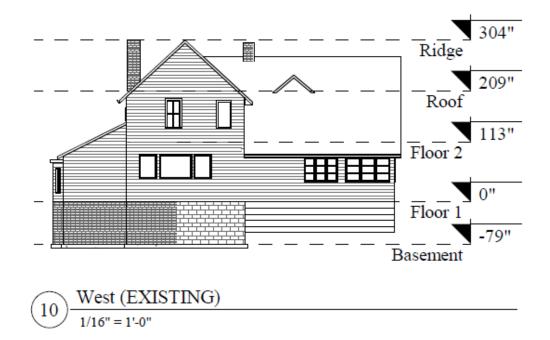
Existing Structure, rear elevation, 869 Sangster Avenue. (Image from owners.)
